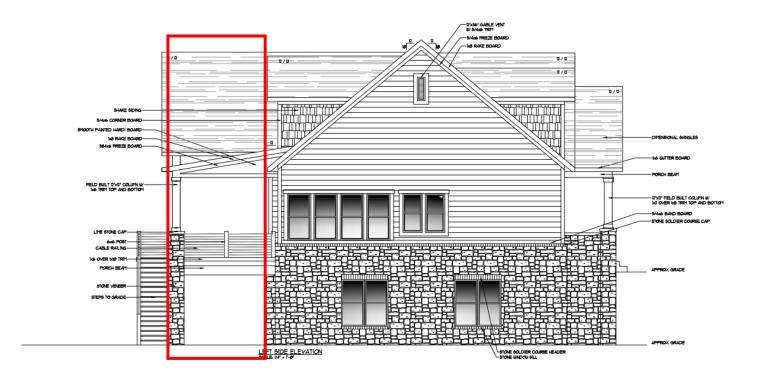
Construction plans for side view of home (lakeside porch on the left)
